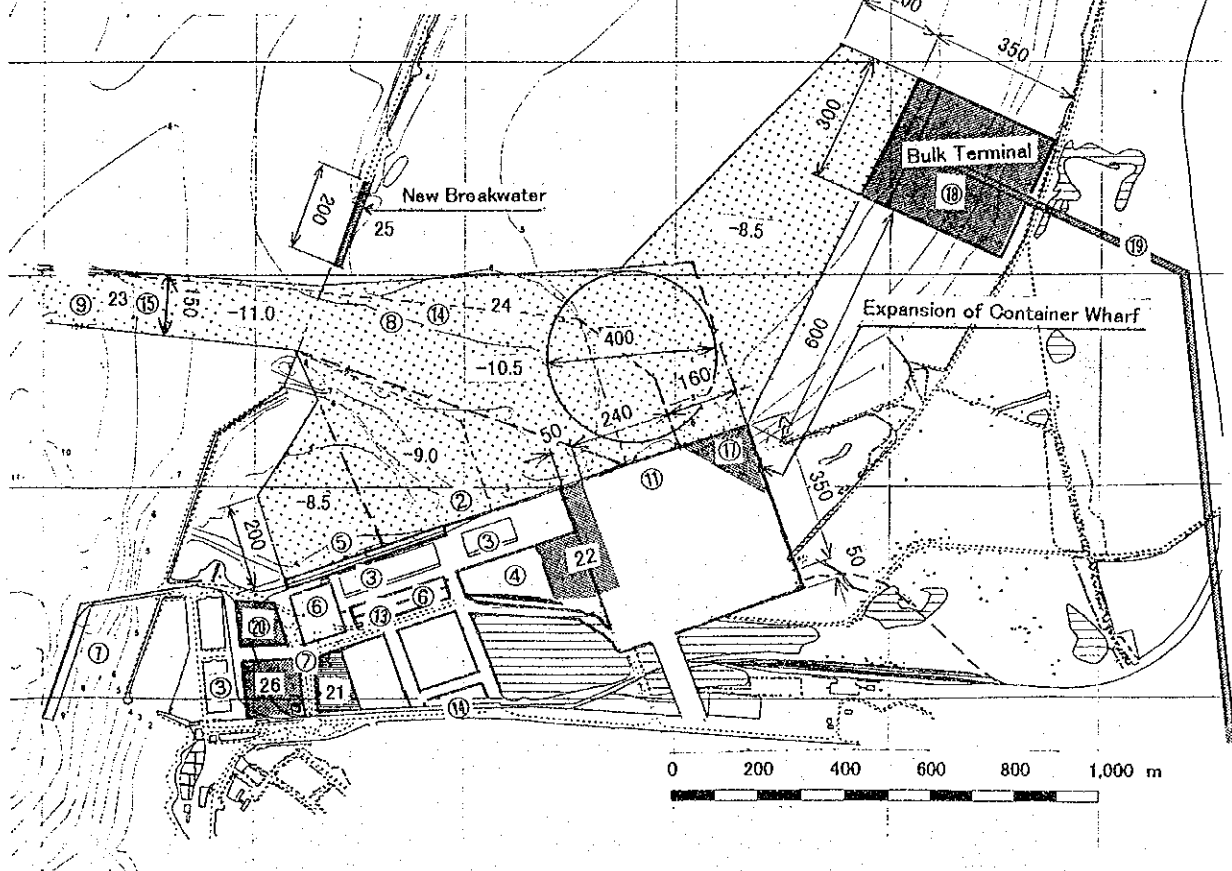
Layout of the Long-term Development Plan.(up to 2015)
